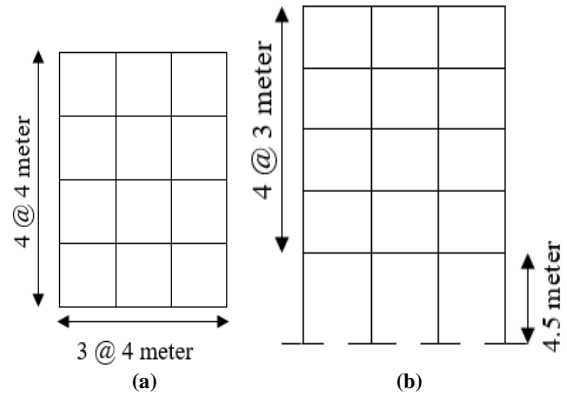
Five storied structure (a) Plan, and (b) Elevation.
